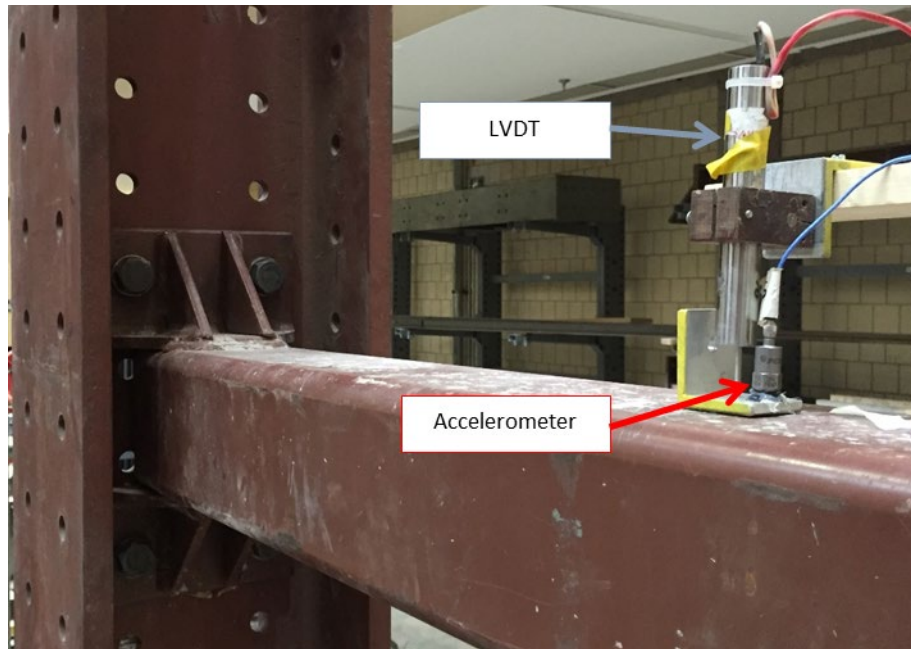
Lab experiment beam-column connection with accelerometer and LVDT attachment.
